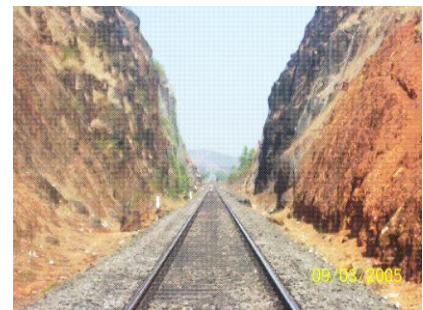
A typical KRCL stretch with narrow tracks & steep side slope
